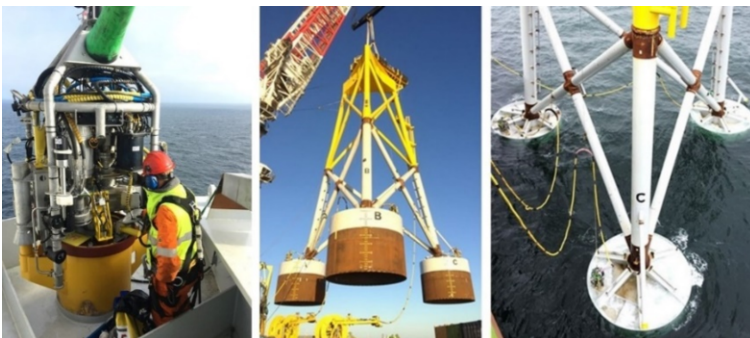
Suction pump arrangement used for Ørsted's Borkum Riffgrund 02 SBJ installation (Photos: NGI-FRAMO).
